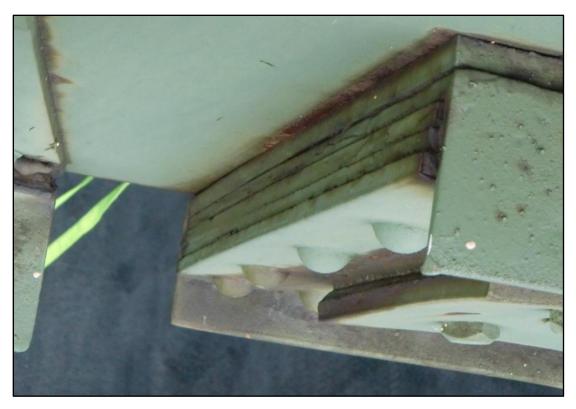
Wear to Paint Indicating Hinge Movement, SE  $L_{13}$ , Span 3.
